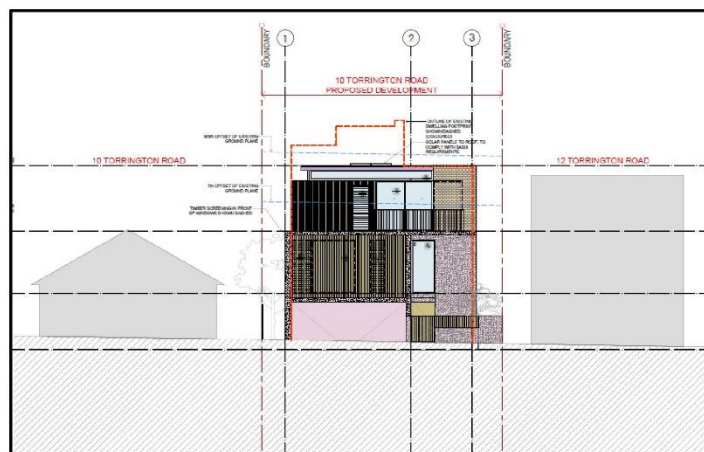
Extract of the Street Elevation demonstrating that the height, bulk and scale of the proposed new building is compatible with the adjoining 3-storey dwelling to the east at 12 Torrington Road
